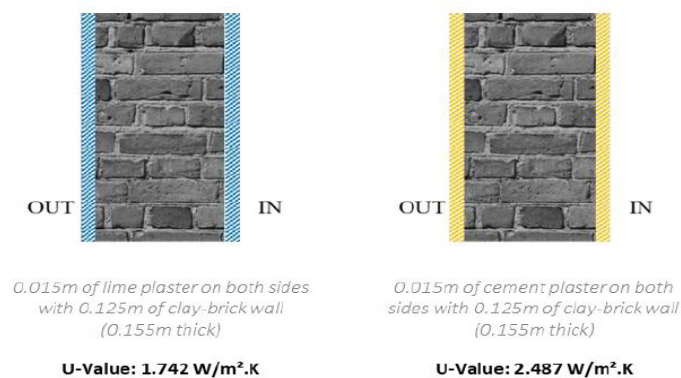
Typical sections of the envelope: lime plaster and cement plaster space
